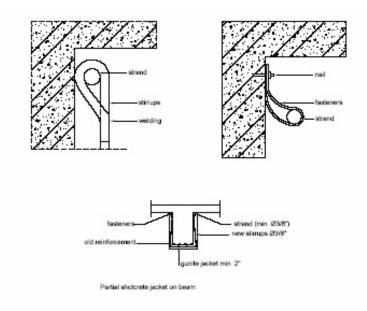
Strengthening of concrete slab-beam system by three-sided jacketing
